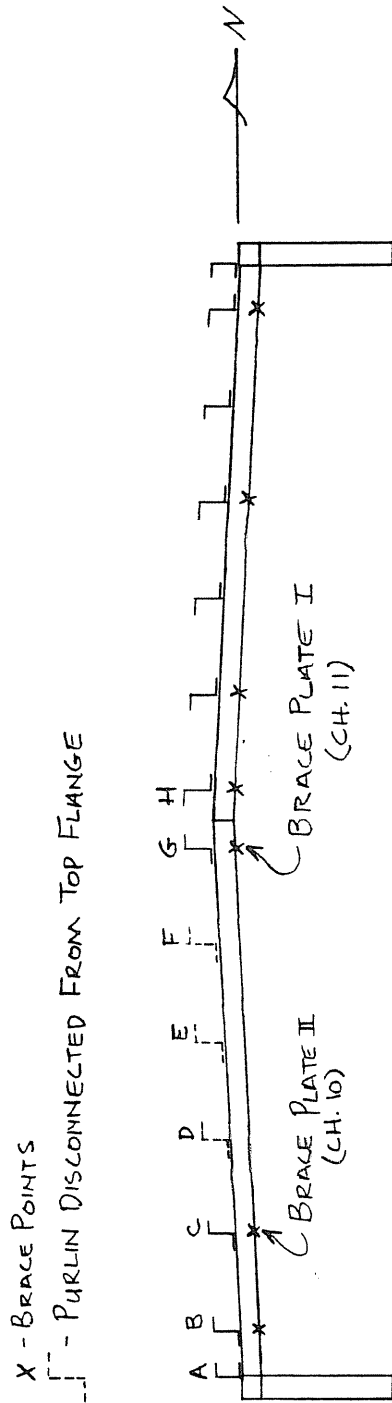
Bracing Scheme 1, 20 ft. Unbraced Span (Span CG)
